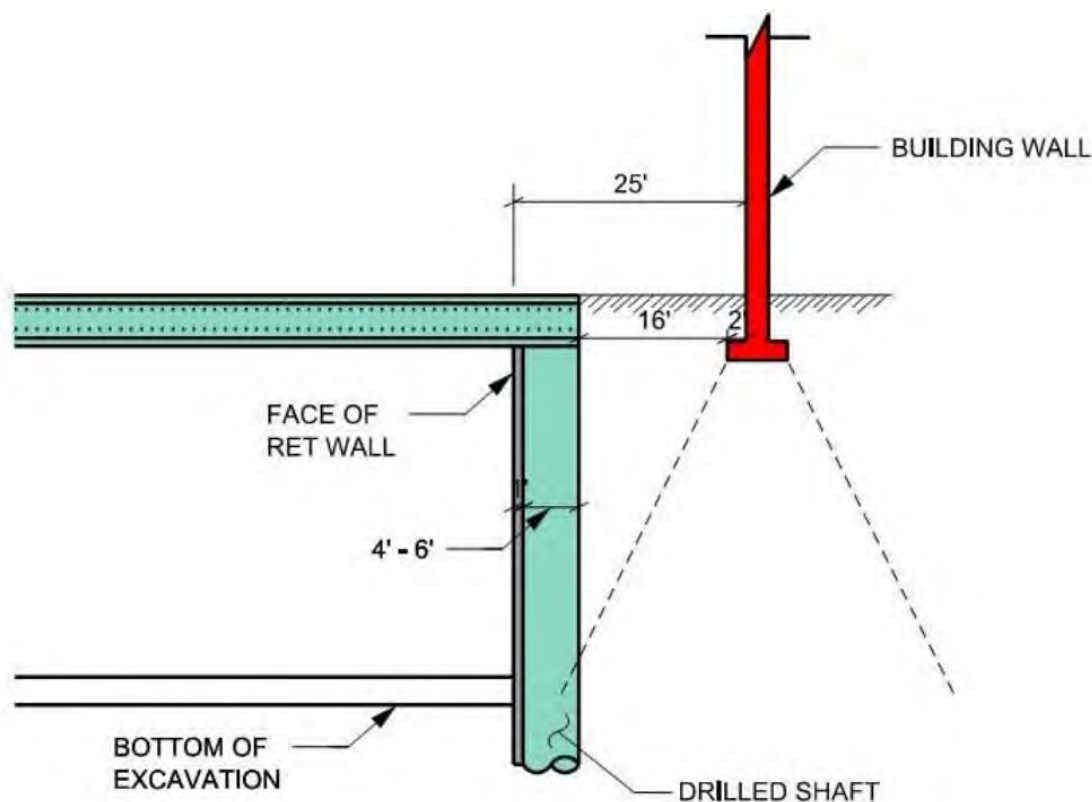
Diagram showing relationship of proposed retaining wall construction to Resource 016.
